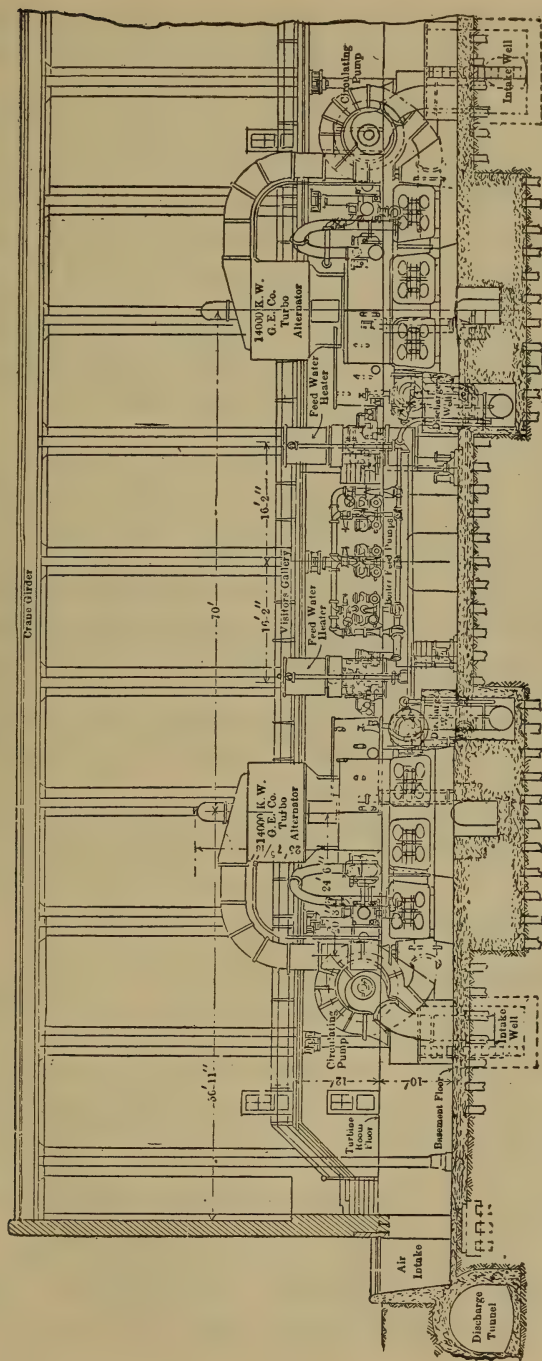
Side Elevation, Quarry Street Station, Units 1 and 2.
